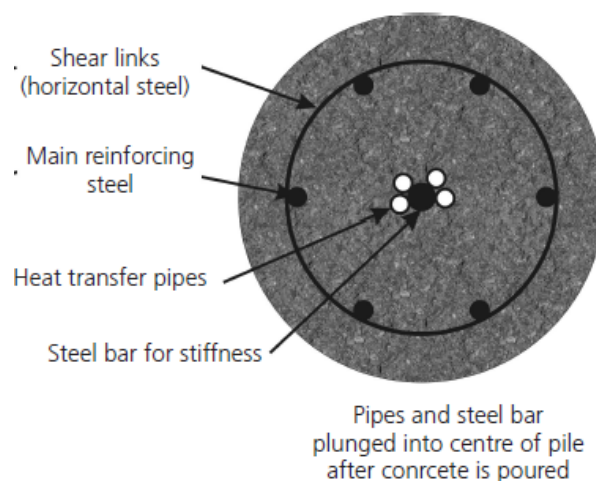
Pipes and steel bars are inserted into the center of the pile after the concrete has been poured [17]
